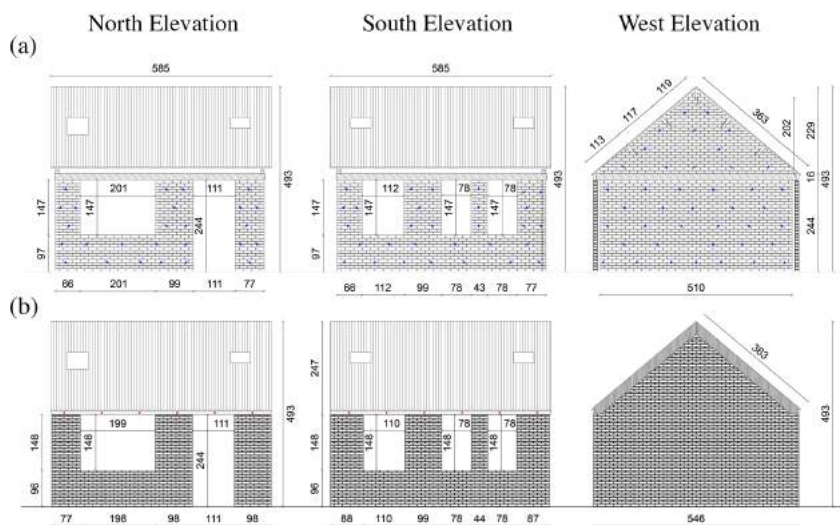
Elevation views: inner CS leaves showing location of ties (a), outer clay leaves (b). The RC first floor slab covered the span between the two transverse (East and West) inner CS walls. The inner CS masonry was continuous along the entire perimeter of the house,
